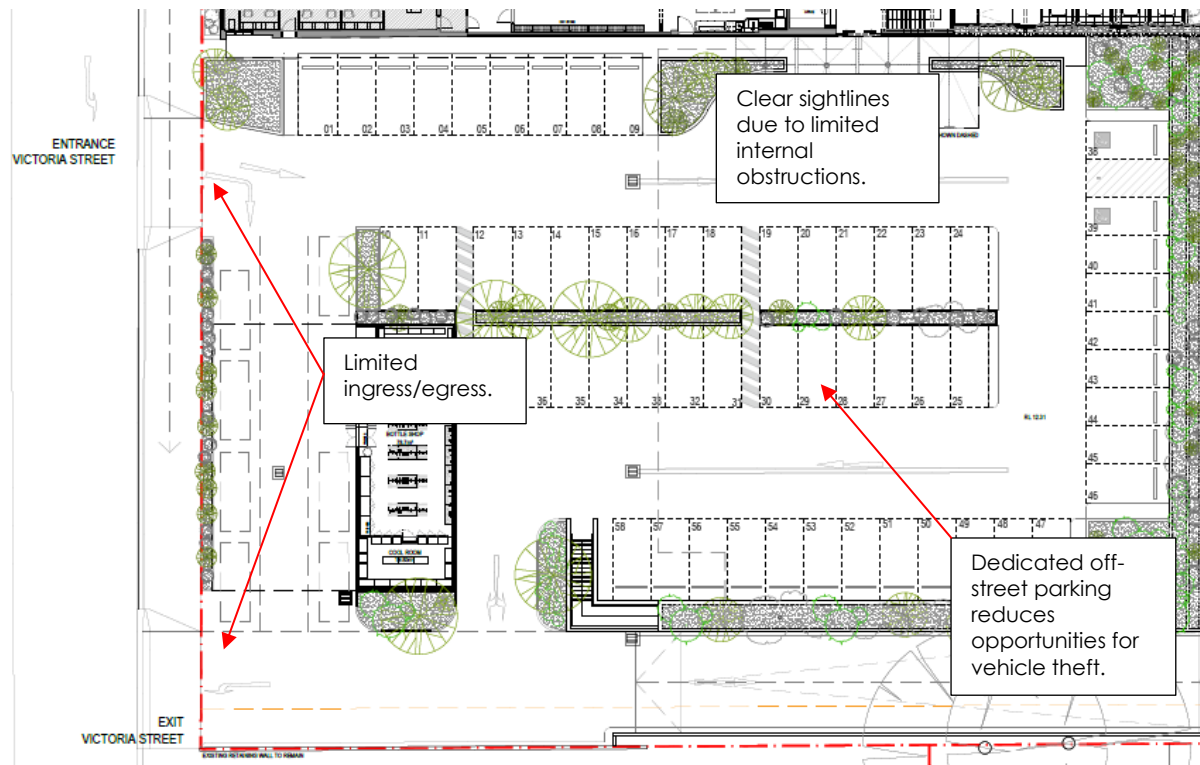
Extract from Ground Floor Plan (Source: loopcreative, 2023)
